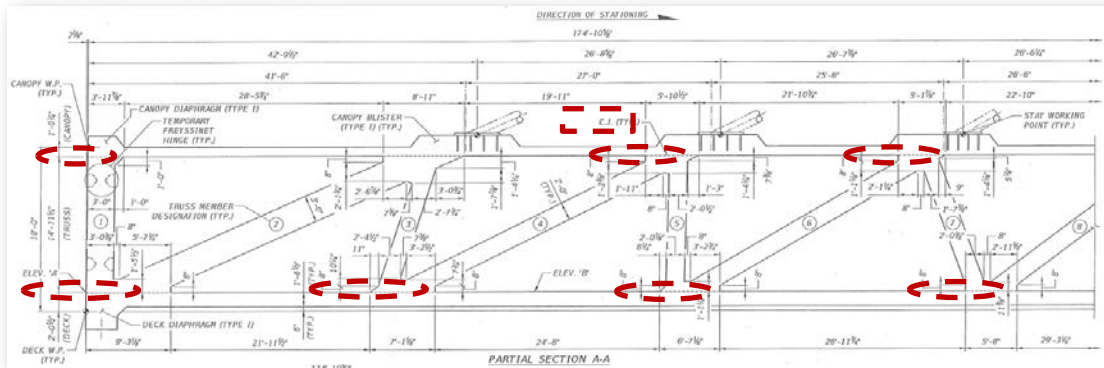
Example of Diagonals to Deck/Canopy construction joints. The construction joint call outs and locations are outlined in red.²⁵³
